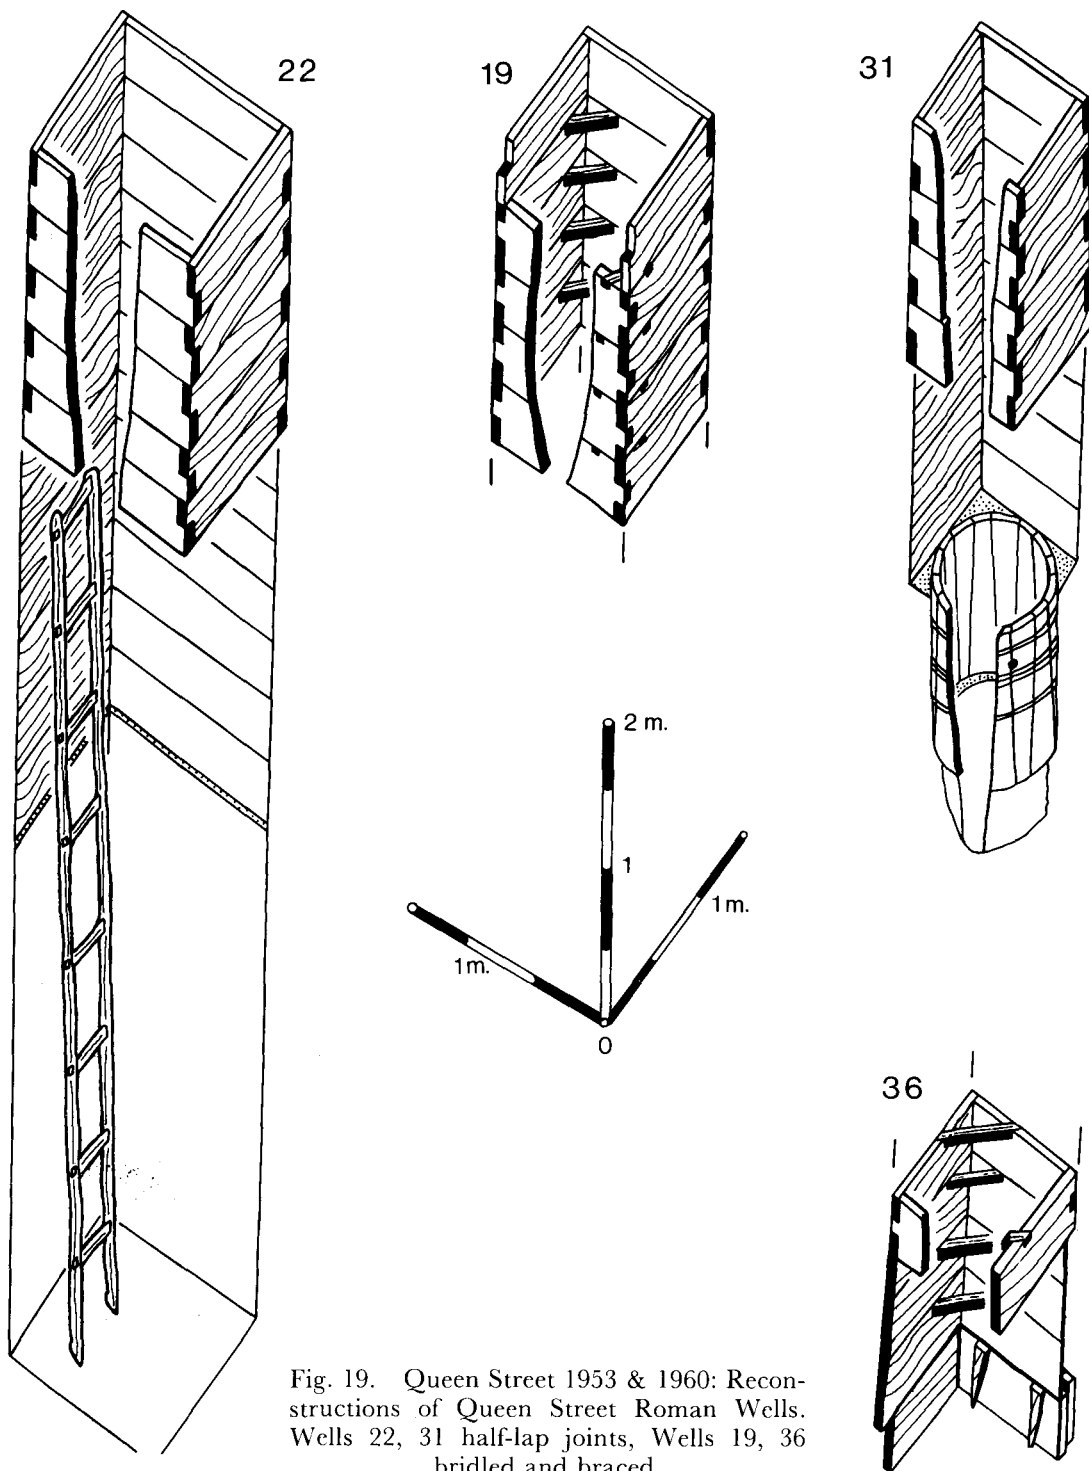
Queen Street 1953 & 1960: Reconstructions of Queen Street Roman Wells. Wells 22, 31 half-lap joints, Wells 19, 36 bridled and braced.
